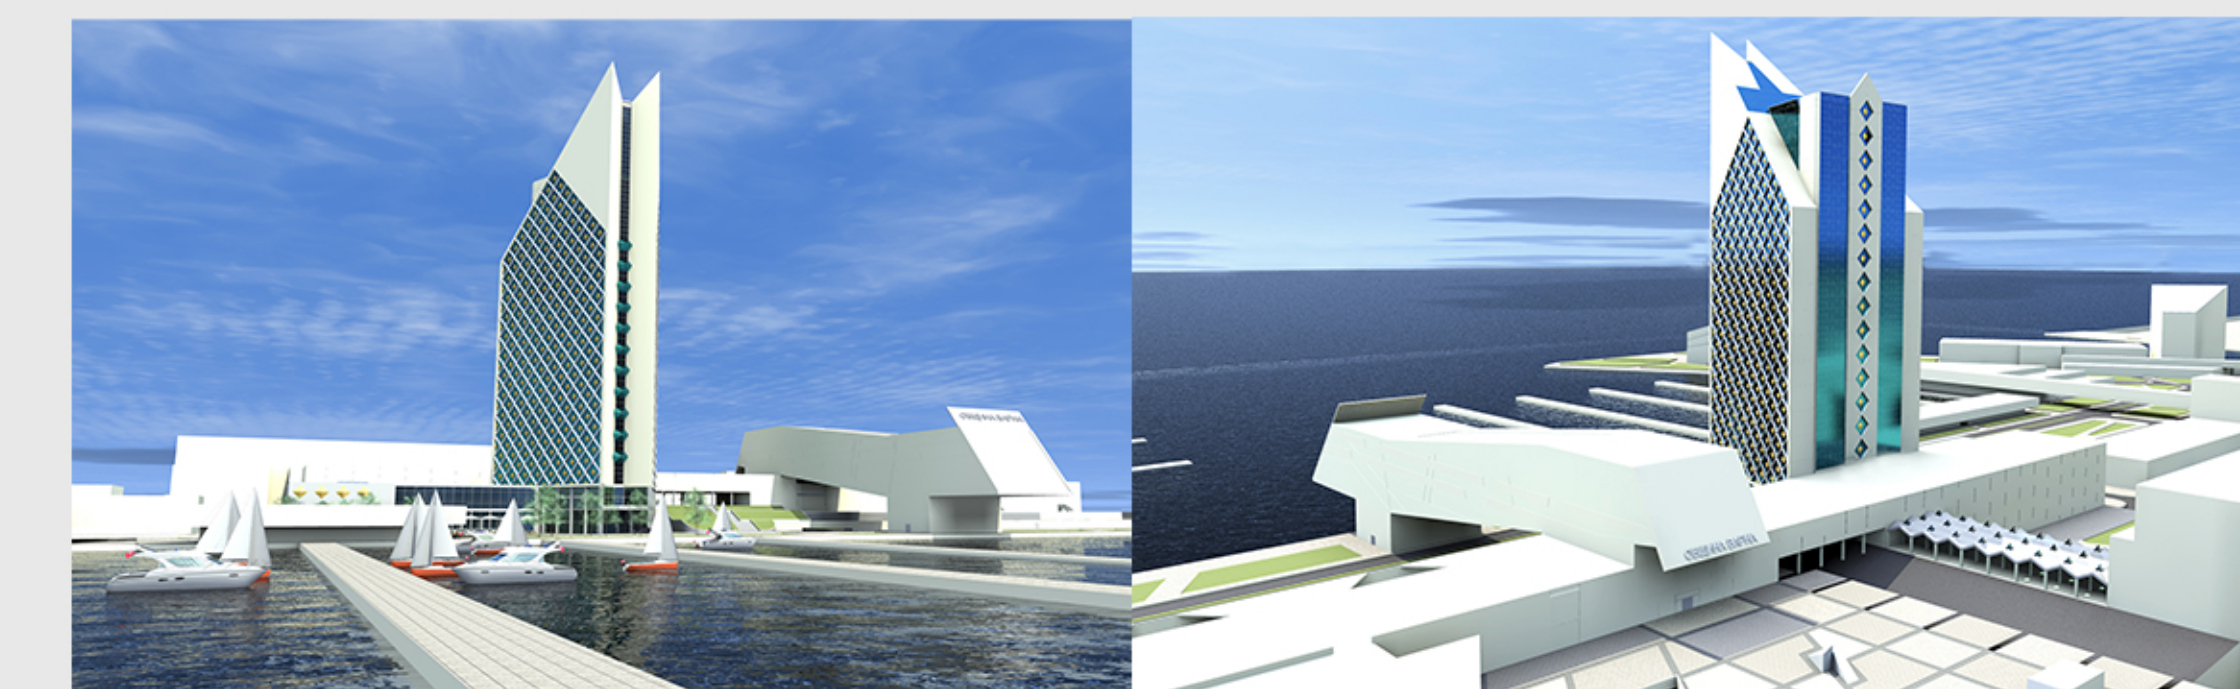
Master Plan of Burgas, 'Geo stroke' team, 2011
